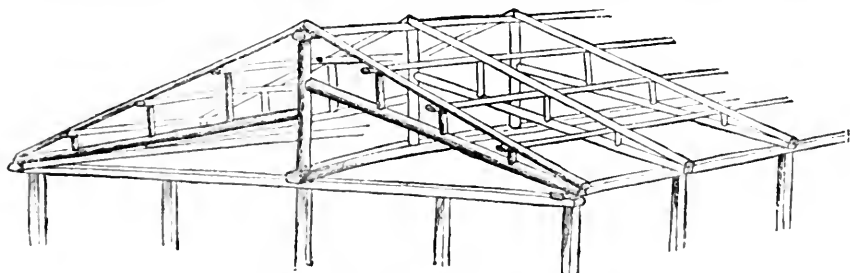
ROOF-FRAME OF LARGE BUILDING.
